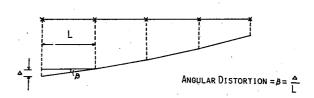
DEFINITION OF ANGULAR DISTORTION FOR FRAMED STRUCTURES
